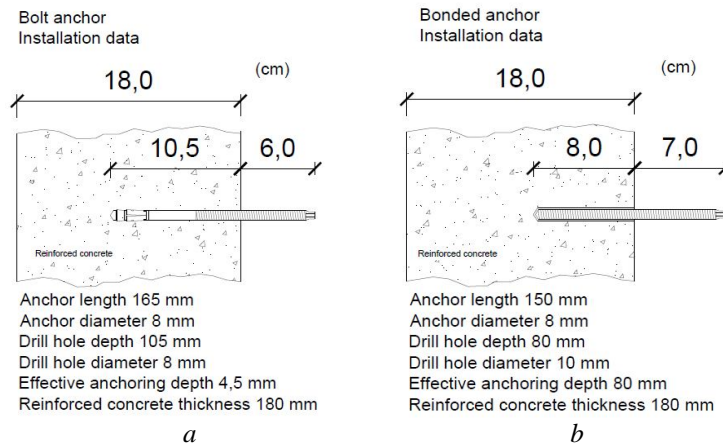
Installation of *a* – bolt anchor and *b* – bond anchor in reinforced concrete specimen.
